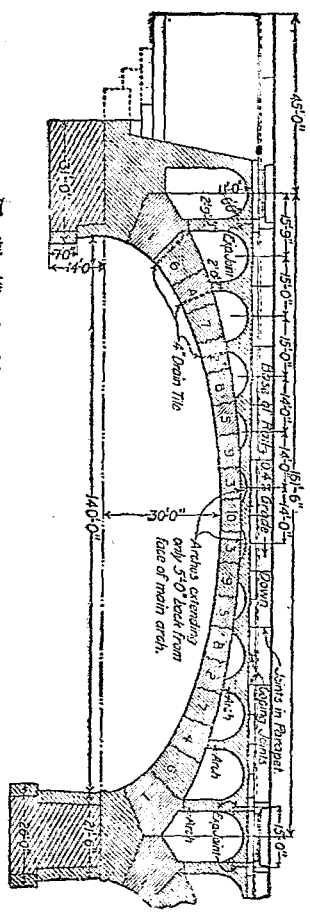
ELEVATION DETROIT AVENUE ARCH, CLEVELAND, OHIO.
